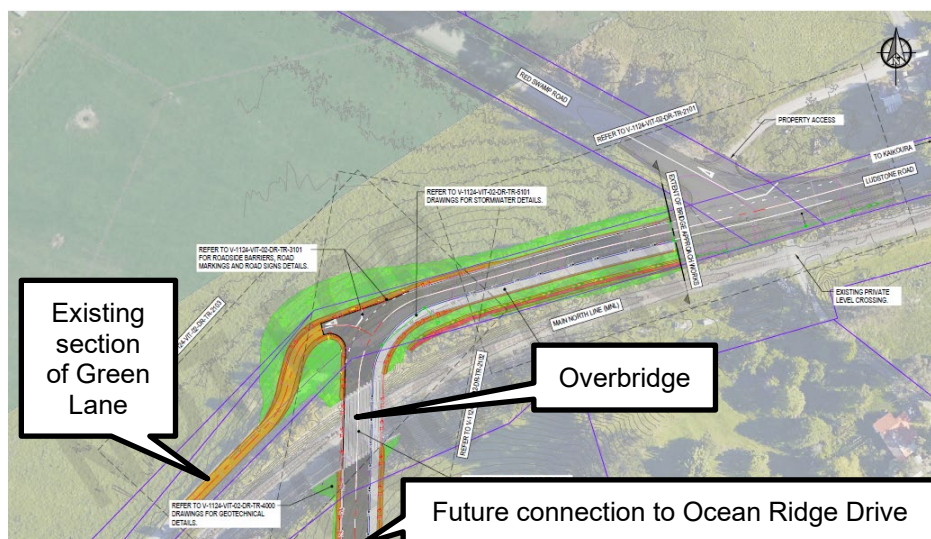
Indicative layout of Proposed Rail Overbridge and Green Lane / Ludstone Road / Red Swamp Road Intersection. [Source: Extract from Road Design Overview Plan, dated 09/05/24, prepared by Vitruvius on Behalf of KDC]
